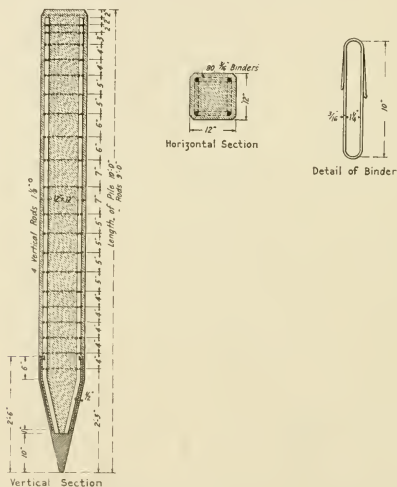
SQUARE (UNPATENTED) REINFORCED CONCRETE PILE USING STEEL PROTECTING POINT.
